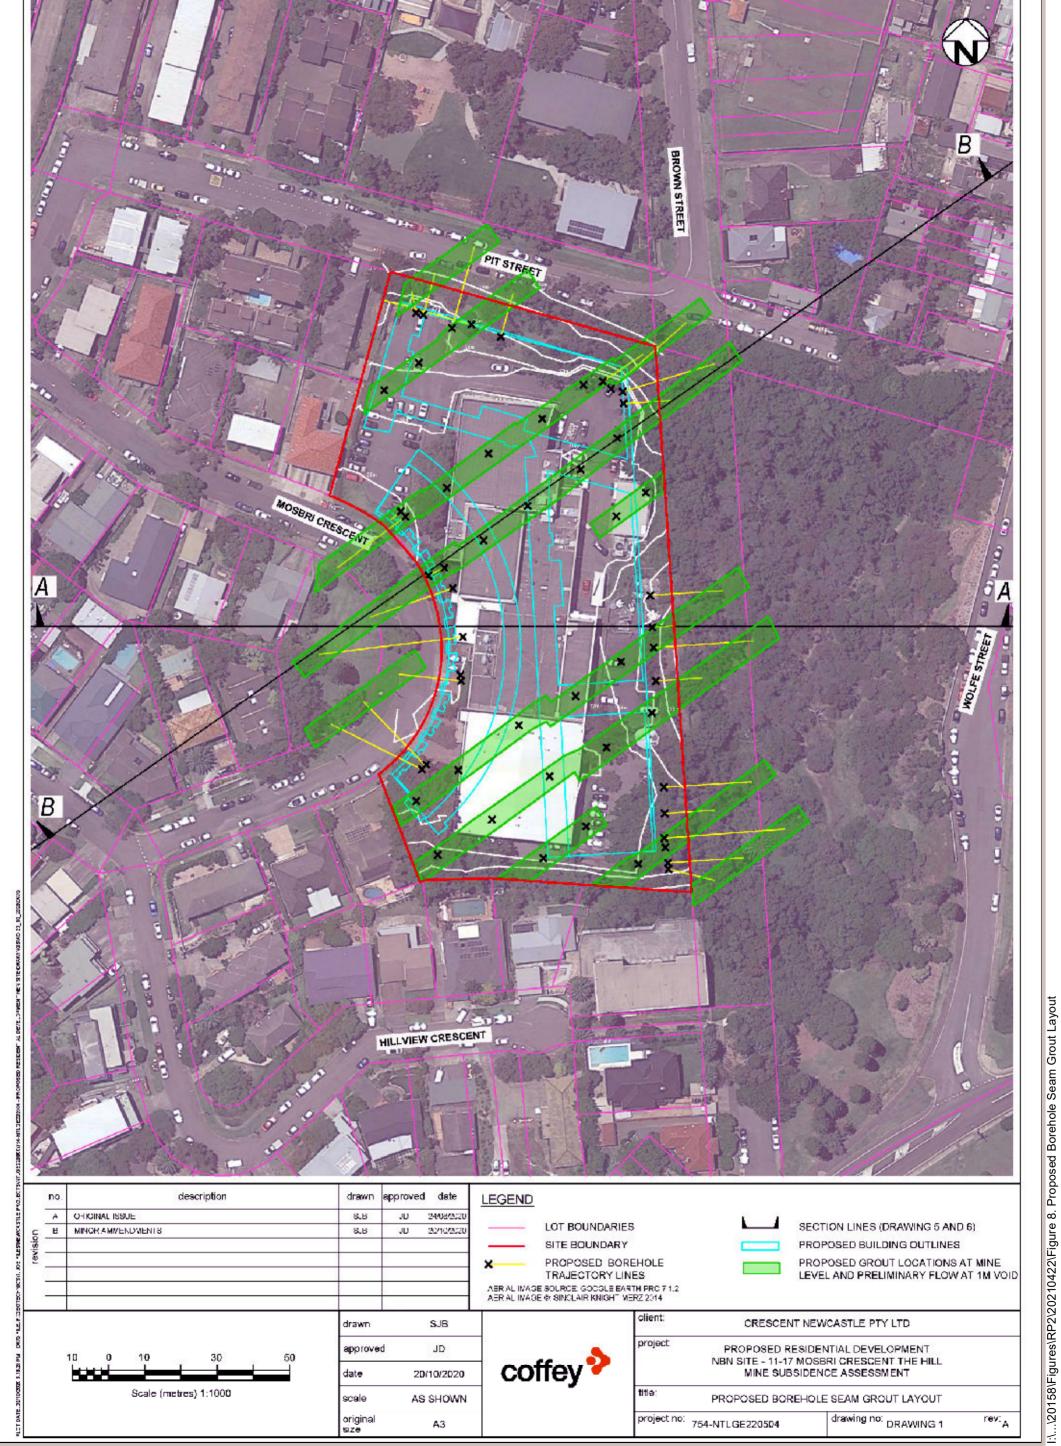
Proposed Borehole Seam Grout Layout (Coffey, 2020)
